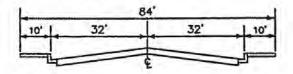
CITY OF CYPRESS GENERAL PLAN ROADWAY CROSS-SECTIONS
